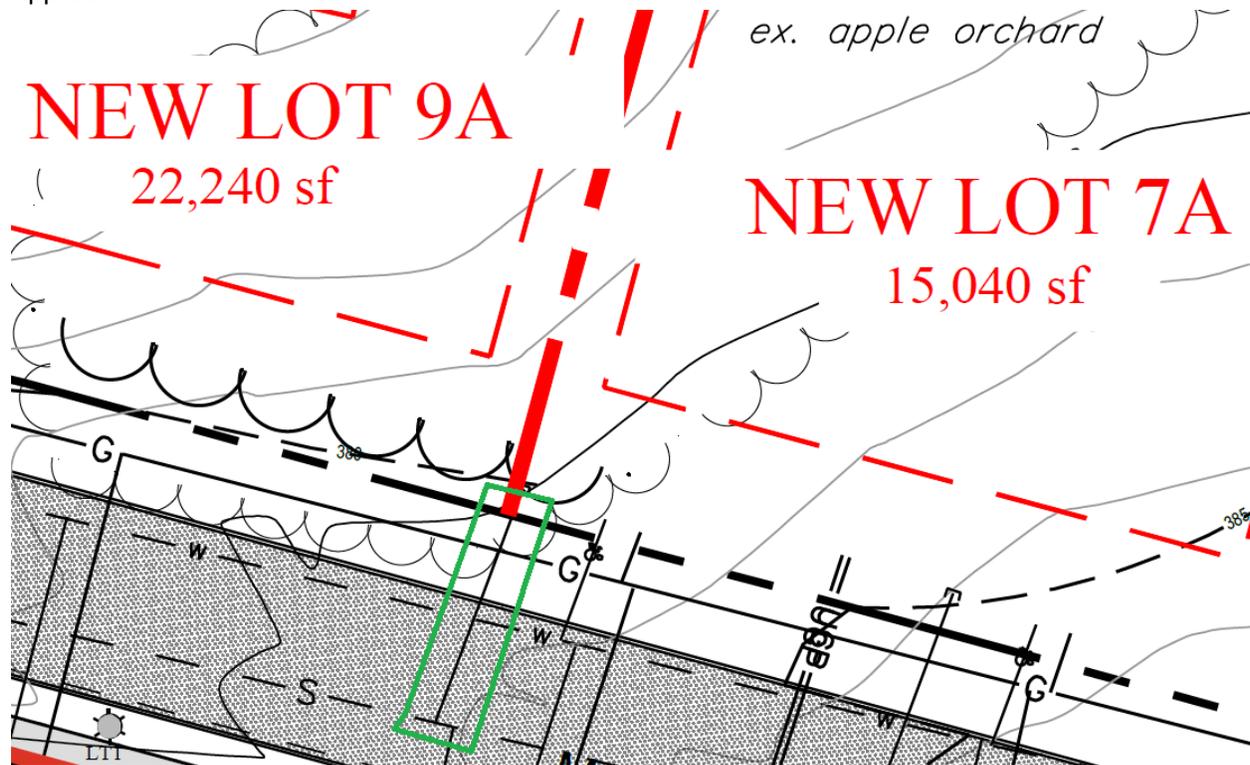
The sewer connection, highlighted in green, does not align with Lot 9A's buildable area as proposed.
